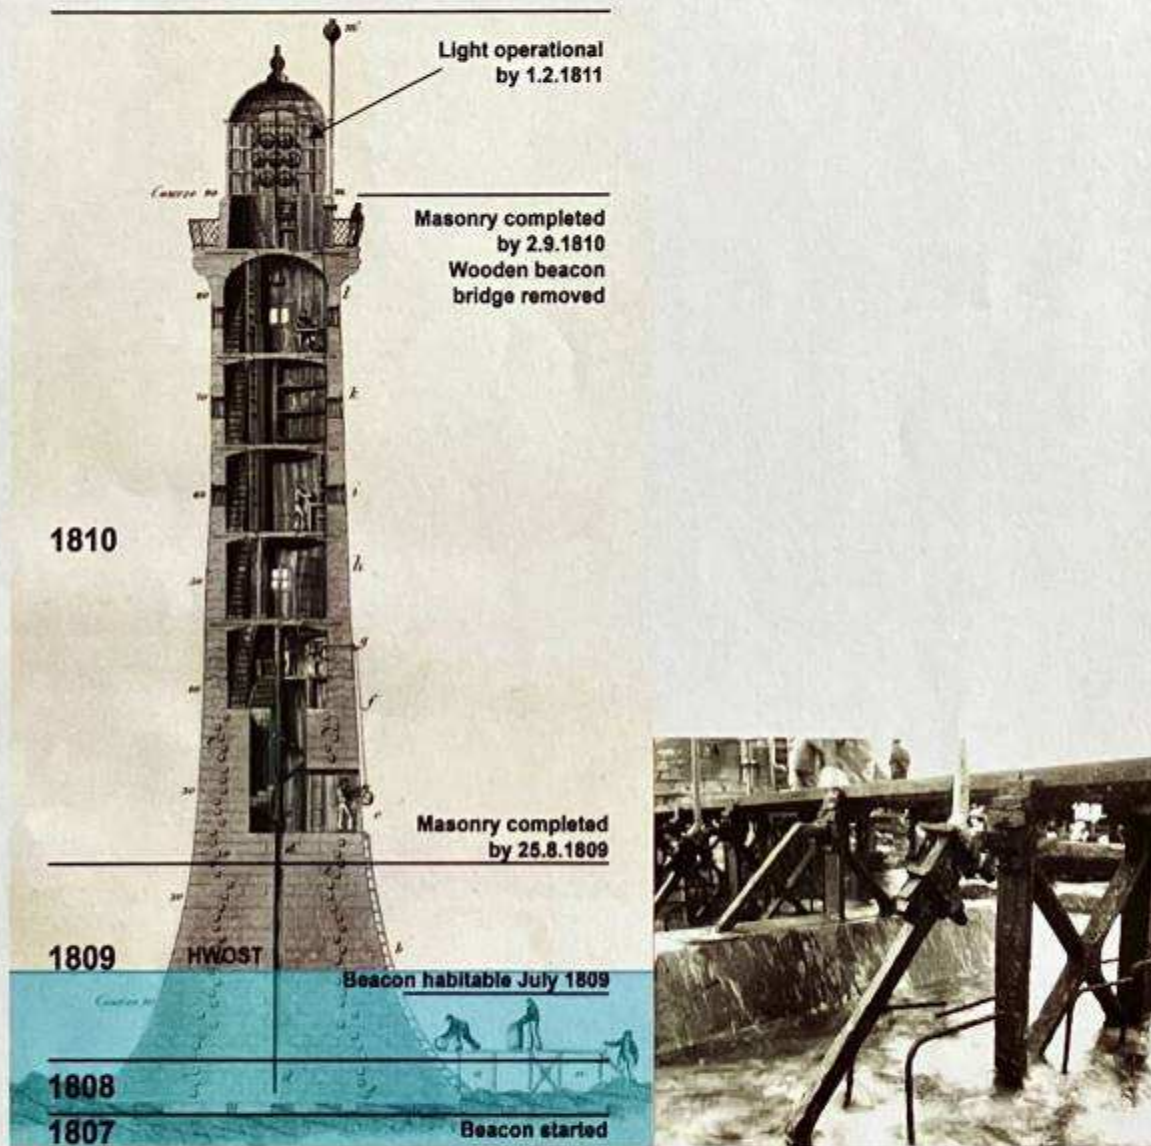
(left). Bell Rock Lighthouse – erection chronology 1807-11 (1, pl. XVI – base image). Slow progress was made before the temporary beacon barrack alongside was habitable. (right) Cast iron [2 ft 8 in gauge] railway over rock surface as seen by author in 1986
